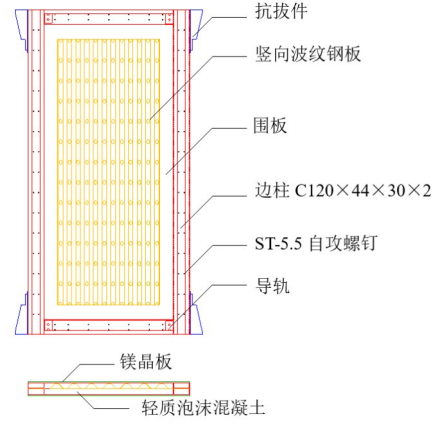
Foam concrete composite walls with embedded corrugated steel plate
